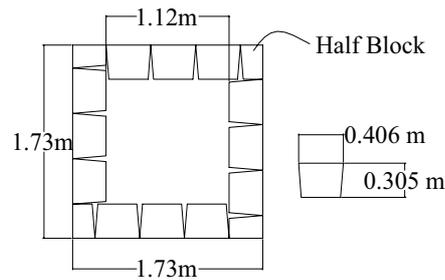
Plan view of experiment (note concrete modular SRW blocks surrounding the GRS mass)
